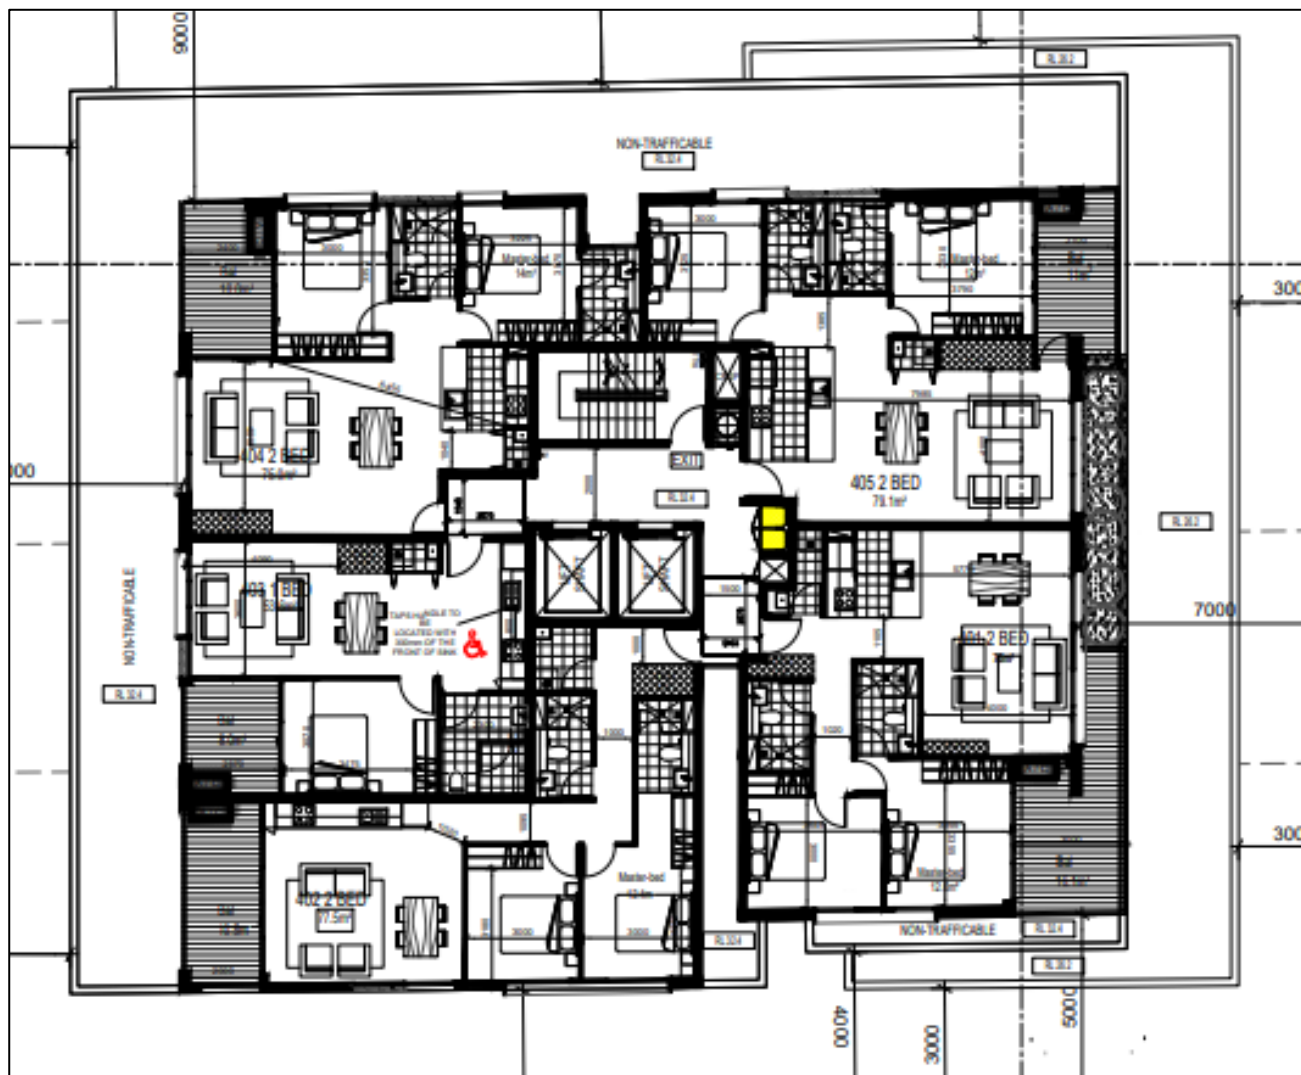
Extract of applicants submitted Level 4 Floor Plan.
